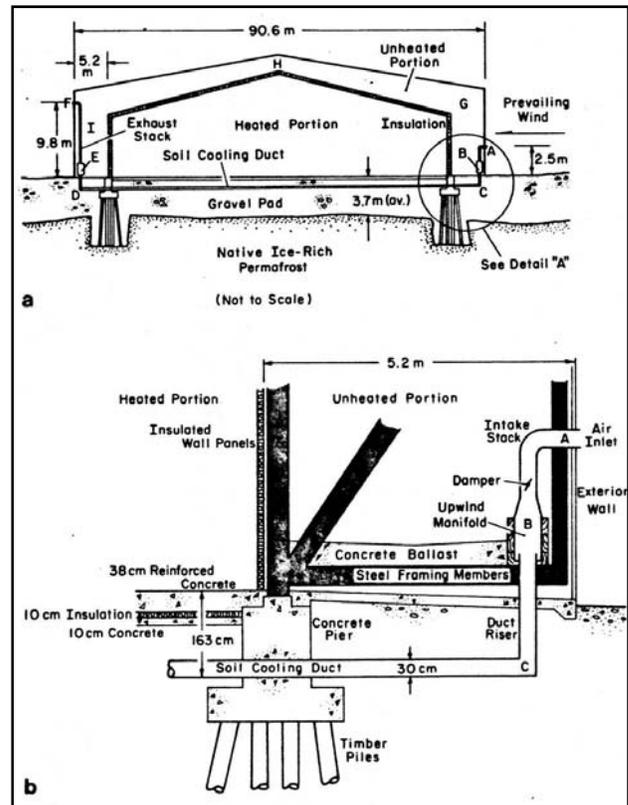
a) Hangar Cross-section b) Detail of pile system and air duct system. (Tobiasson 1973)
